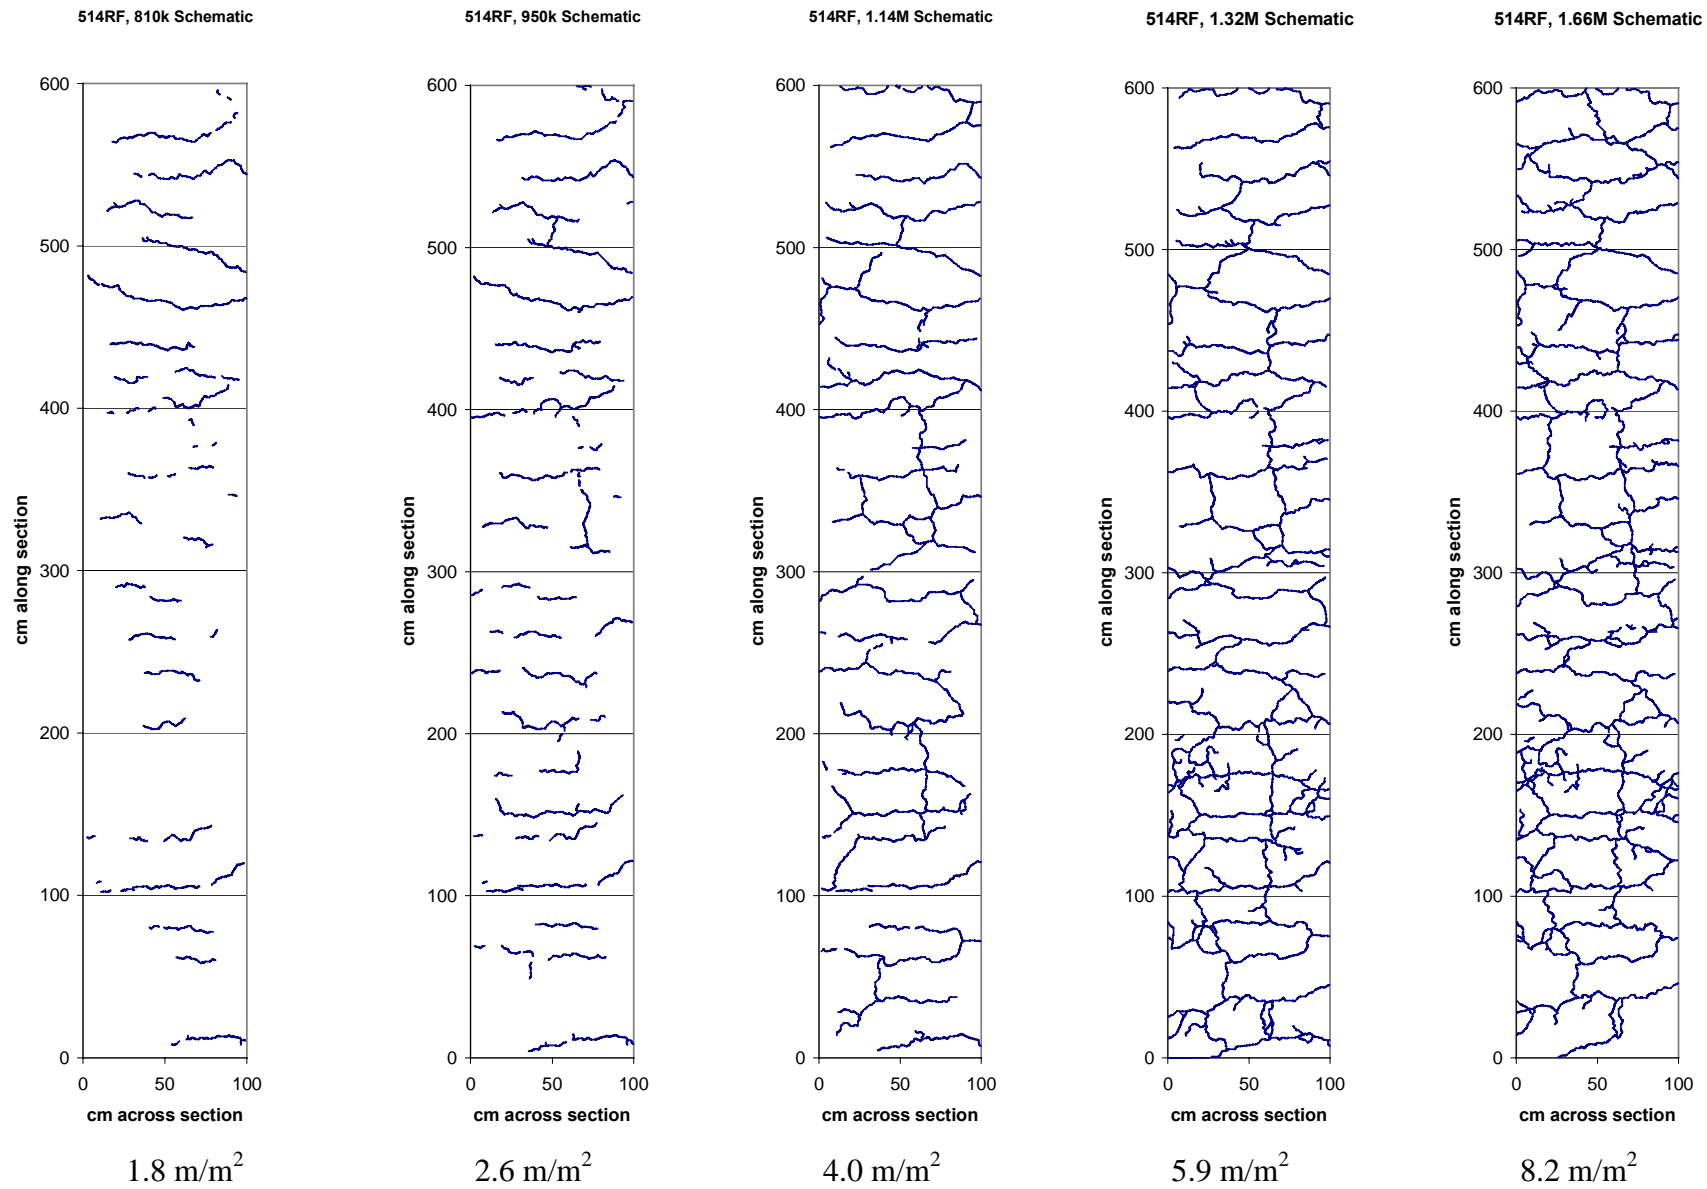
Crack development in Section 514 (drained, DGAC overlay).
